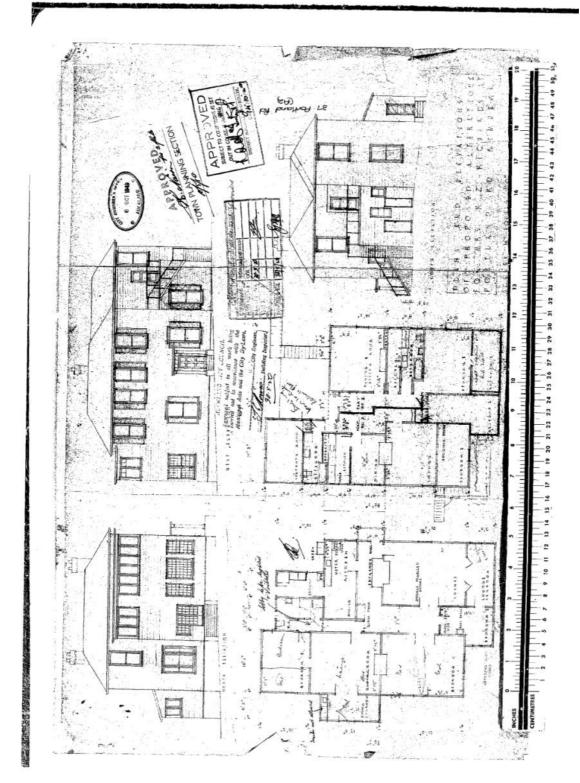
Proposed plans for the conversion of the residence into flats, 1949-50 (B/1982/5607 – Building Consent Plan – O/7973/06, Auckland Council property file: 27 Portland Road, Remuera).
